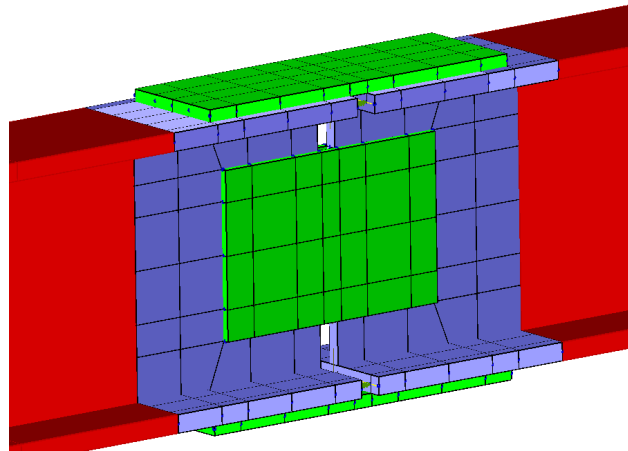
Rendered finite element model of the flange & web plate bolted splice connection
